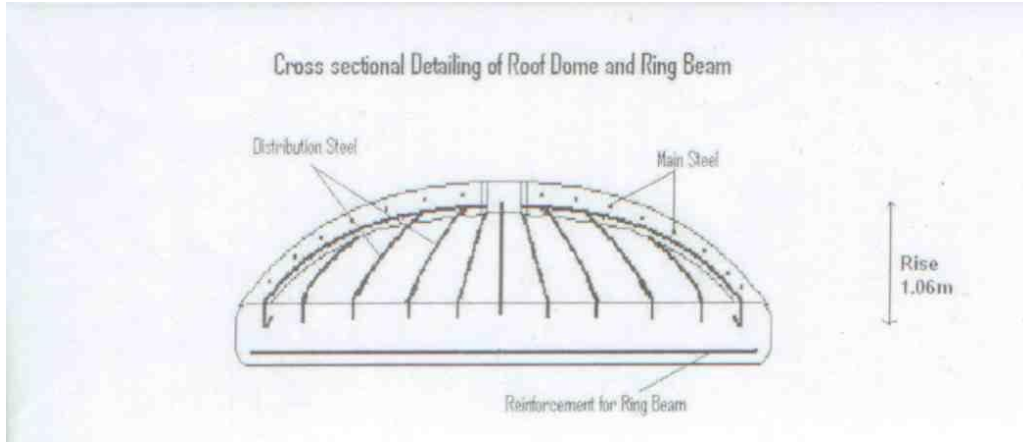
Reinforcement details of the Dome-slab (Cross-sectional view)
